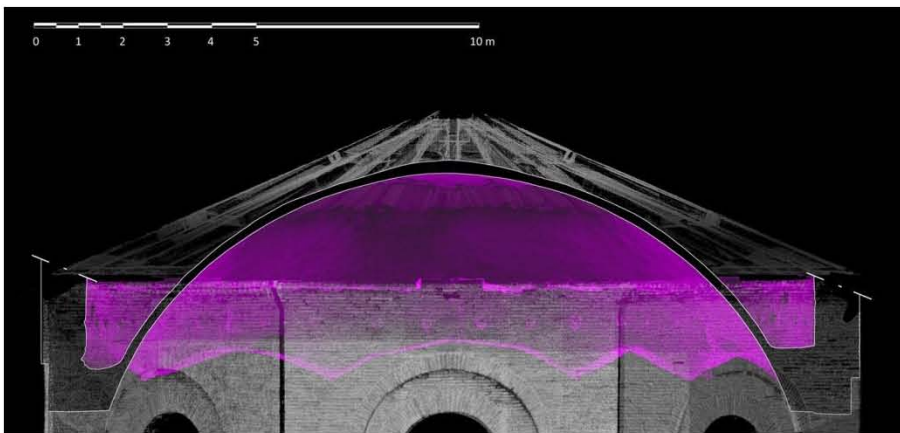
San Vitale church (Ravenna, Italy) vault section showing the dome structure
